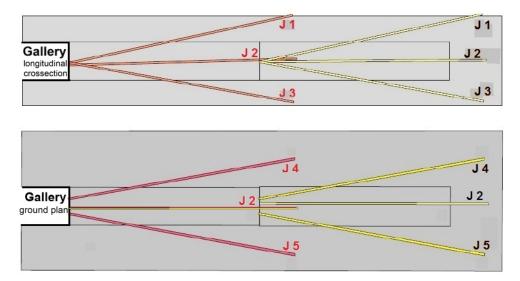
Longitudinal and plan arrangement of safety boreholes ahead of the face (modified from [3]).
